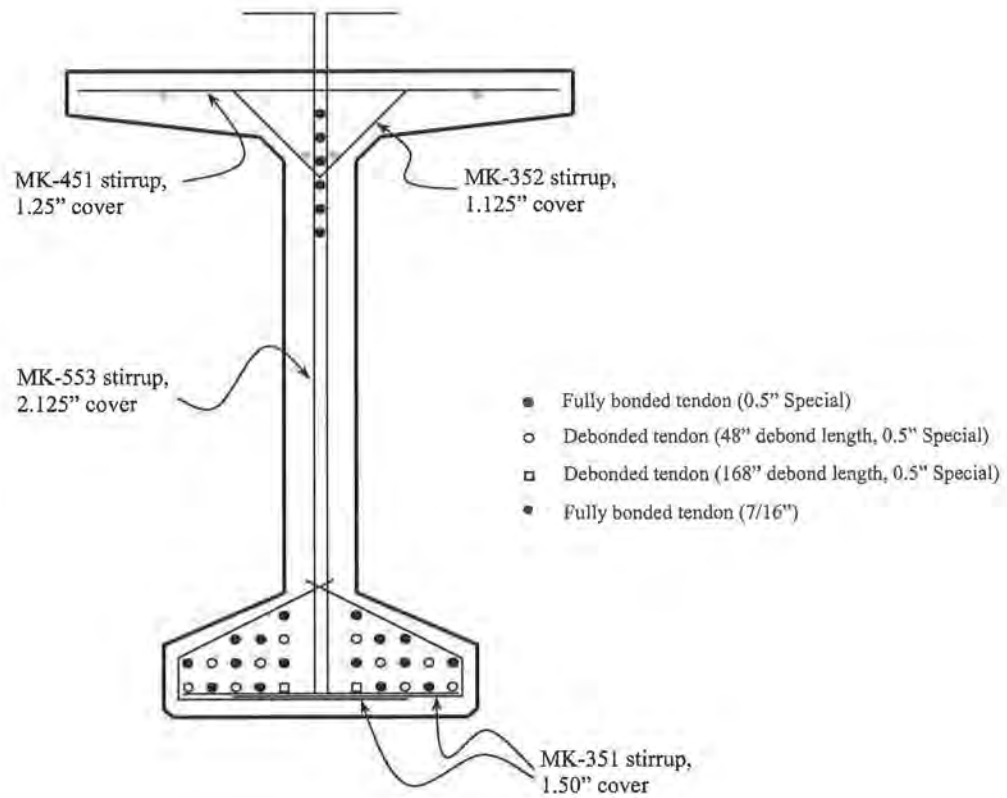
Cross-sectional Configuration of the Vertical Shear Reinforcement at the Girder End
